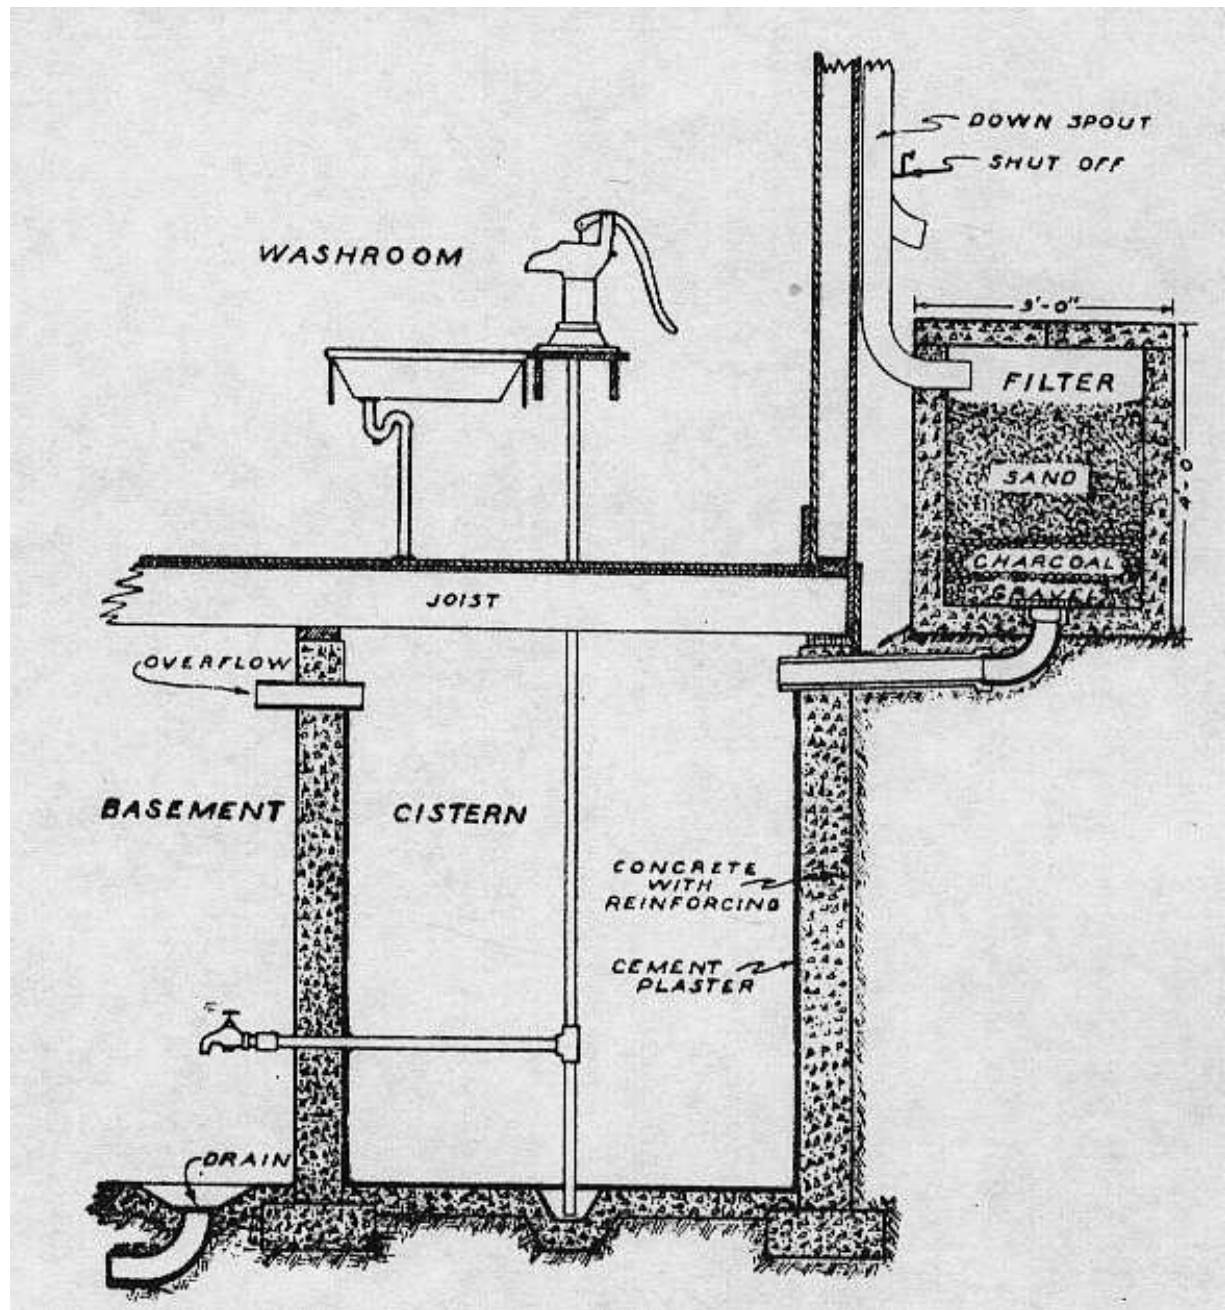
Example of a rectangular cistern (with a simple, above-ground sand-charcoal filter) constructed beneath a house. Note how the ceiling of the cistern was incorporated into the floor structure of the dwelling (Hamilton 1933:3).
